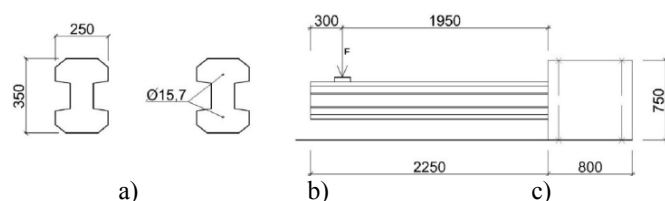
SHAPE OF CROSS-SECTION AND REINFORCEMENT OF COLUMNS: a) THE DIMENSIONS AND SHAPE OF THE CROSS-SECTION, b) REINFORCEMENT OF PRESTRESSED COLUMNS, c) TEST ARRANGEMENT
